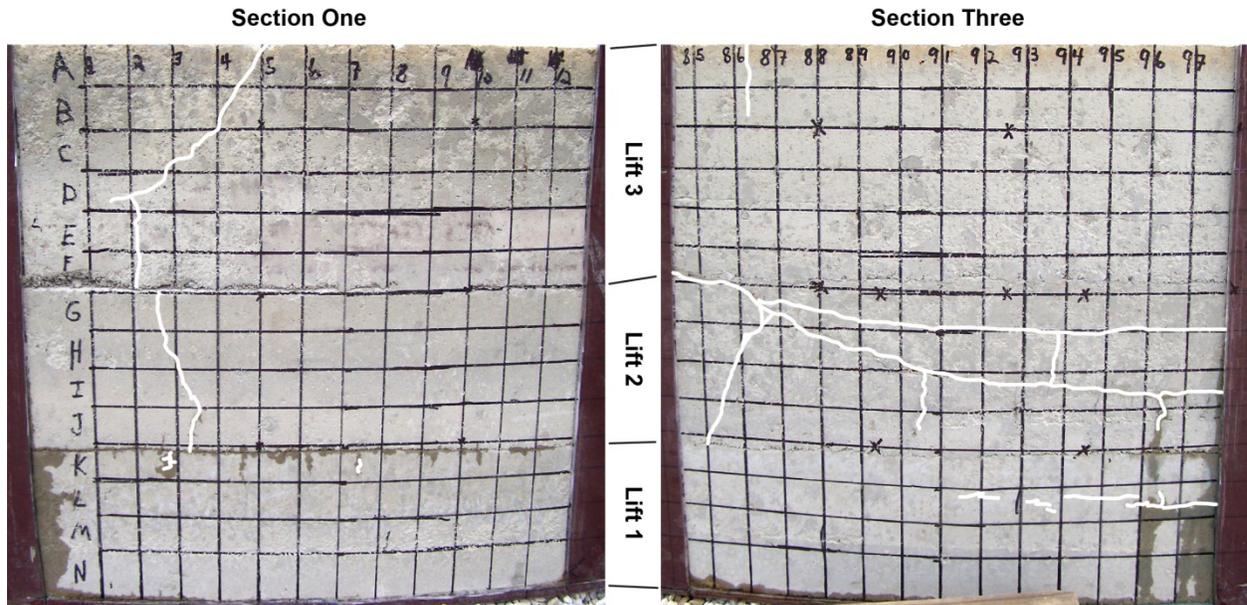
Crack Systems Developed at Intermediate-Scale Grout Monolith's Wall Exposures as of 19 May 2011
